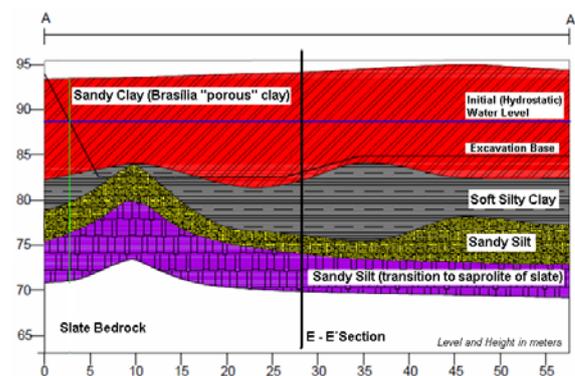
Geotechnical profile of the front view (South Face and E-E' section) of the curtain wall.
